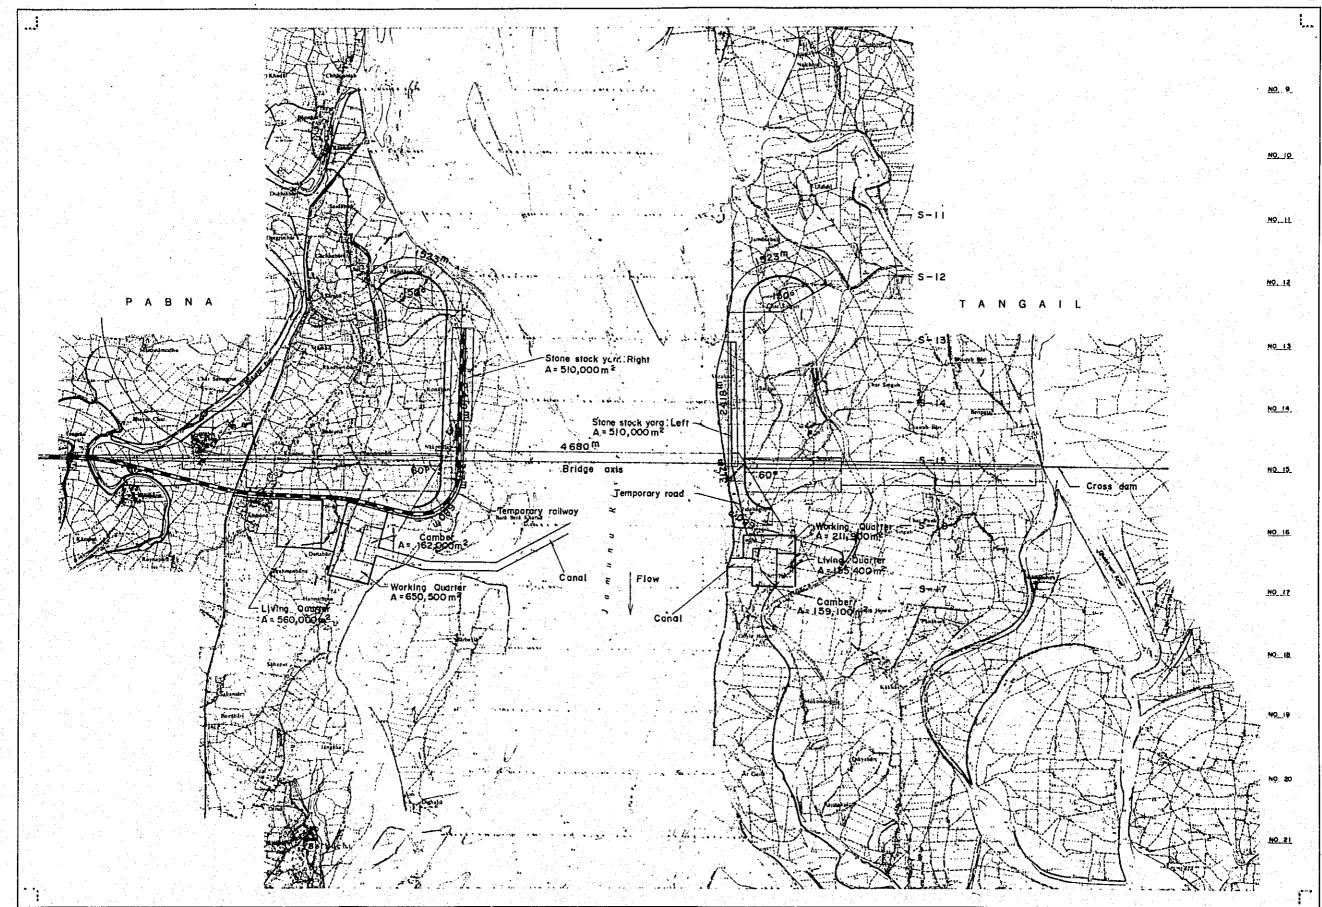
Location of Guide banks, Temporary Railways, Temporary Roads, Construction Base and Stone Stock Yard
